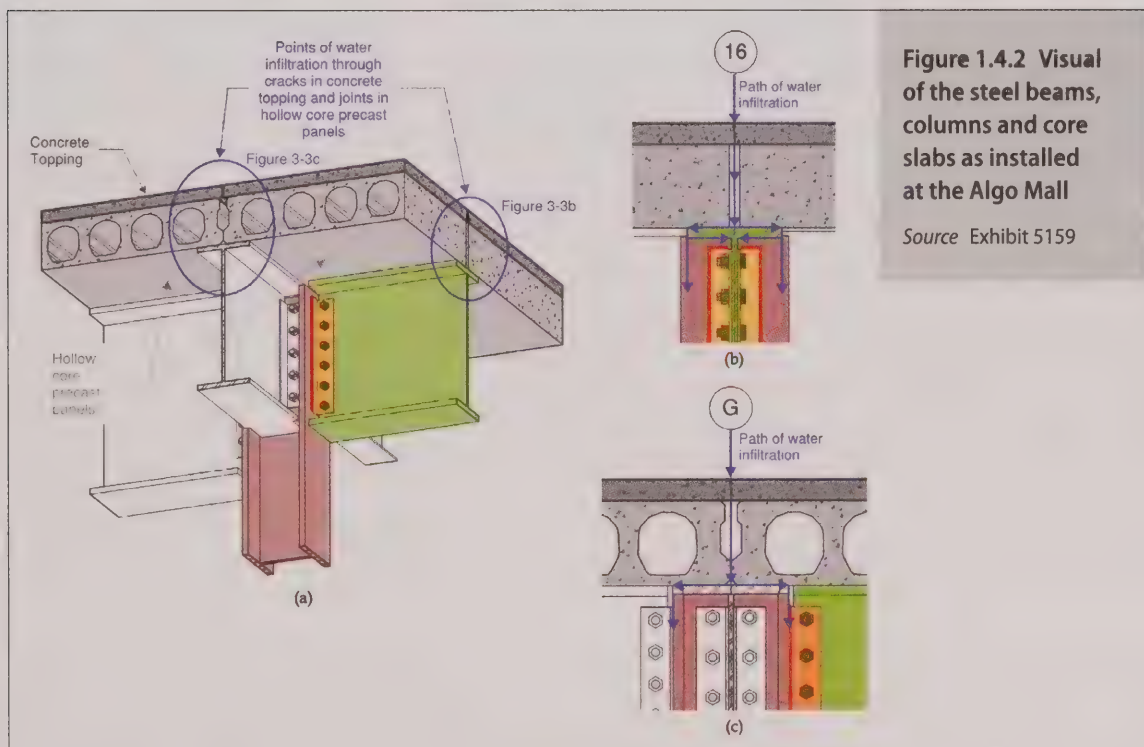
Visual of the steel beams, columns and core slabs as installed at the Algo Mall
